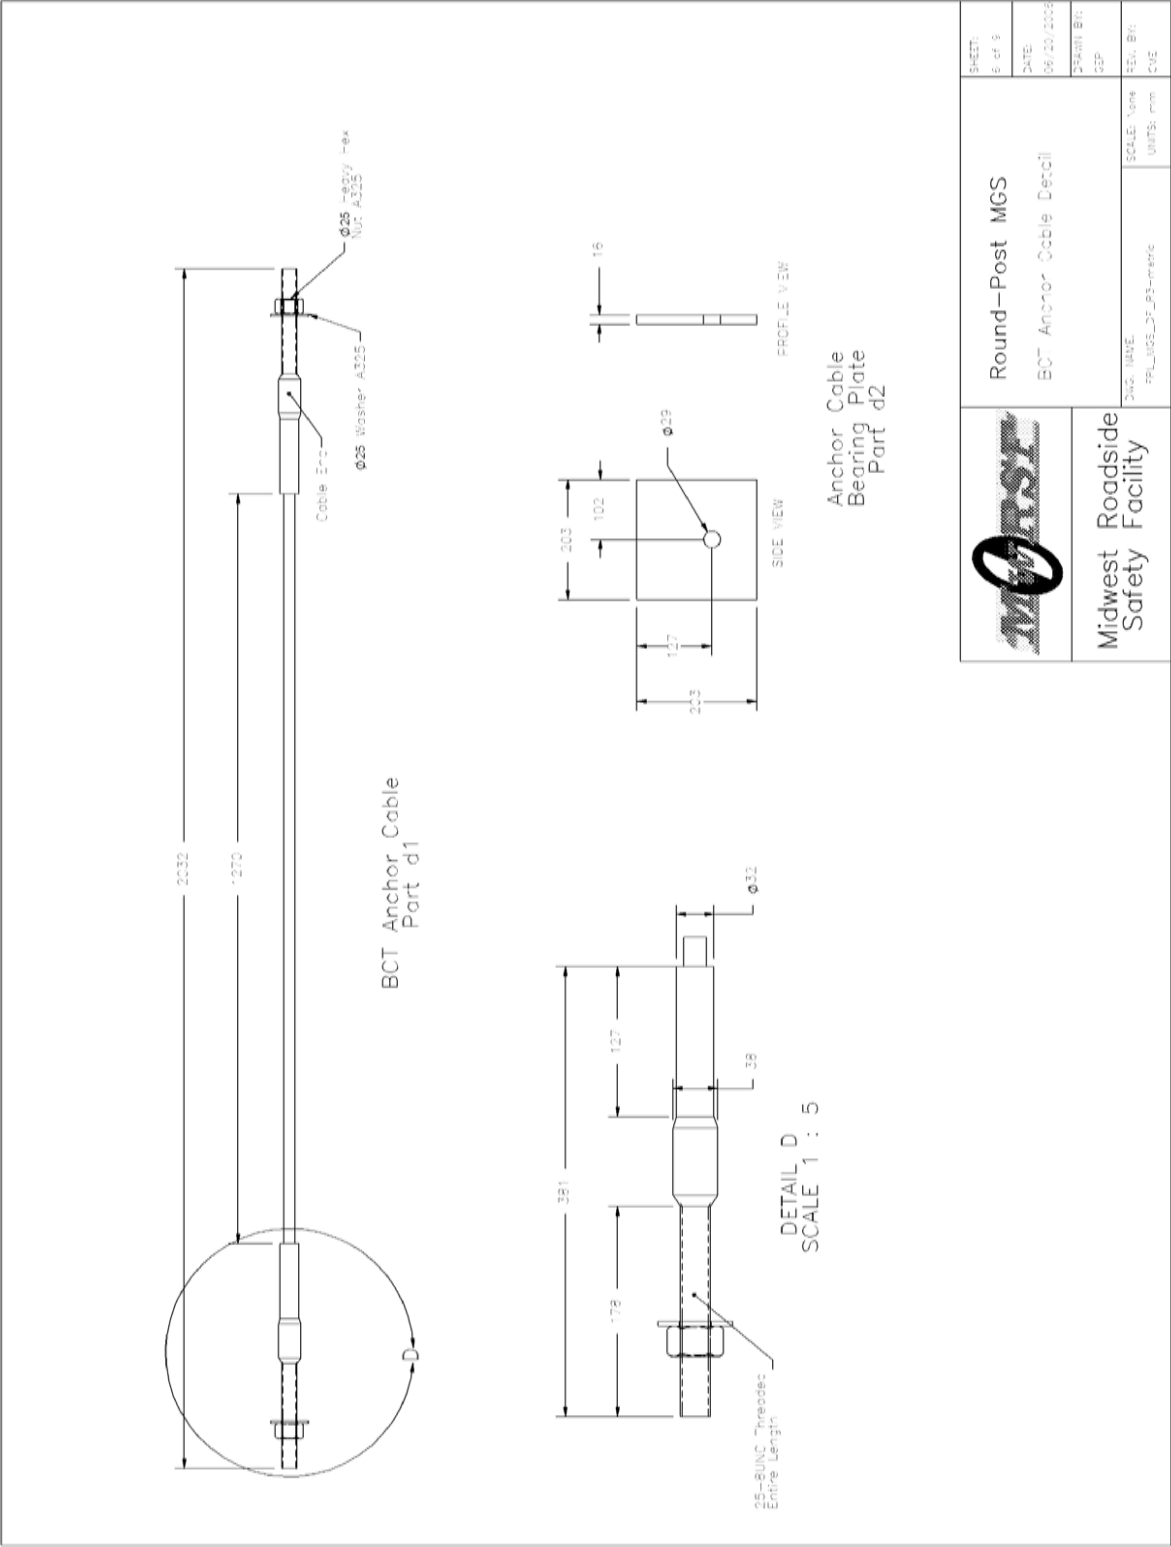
MGS Round Post Douglas Fir Details – BCT Anchor Cable Detail
